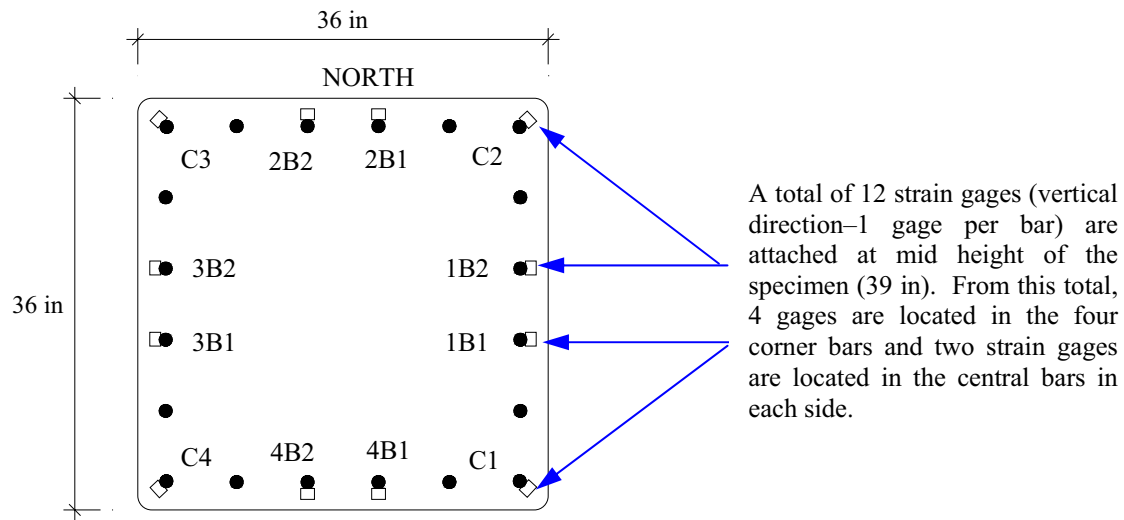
Section B-B; Strain Gages Location on Longitudinal Steel; Specimens G1 & G2
